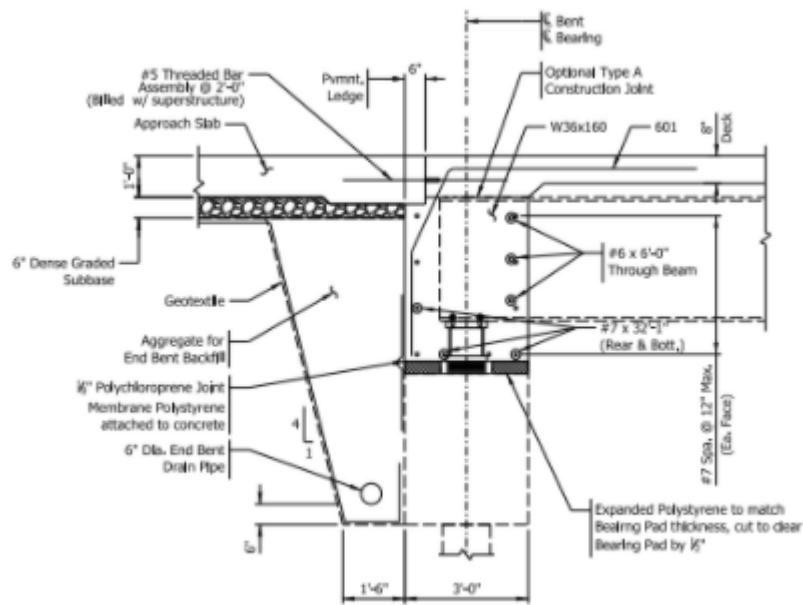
Abutment Detail of the Bridge (NBI 42020) (2016)
